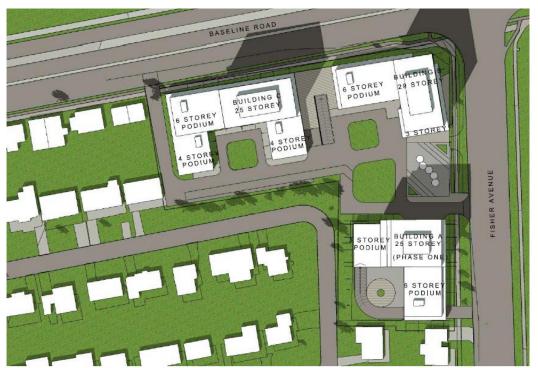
Site plan illustrating the full build-out of the property with two towers along Baseline and a 25-storey setback along Fisher Avenue. Source: Rodrick Lahey Architect Inc. 2022
